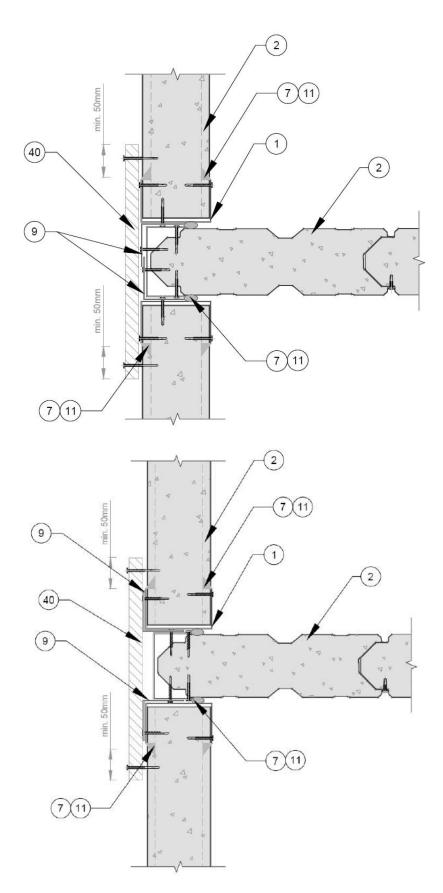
Arrangement of T-junction Details for vertical and horizontal panels supported by floor
